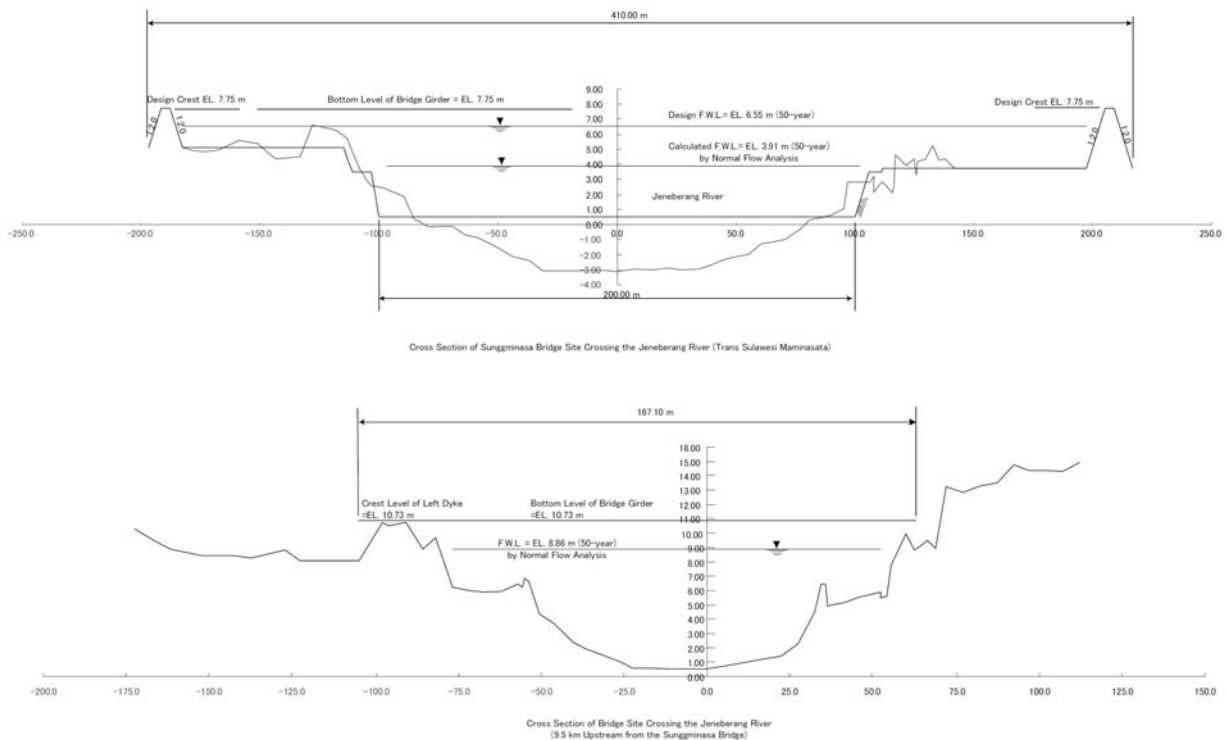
Section of Proposed Bridge Site over the Jeneberang River
